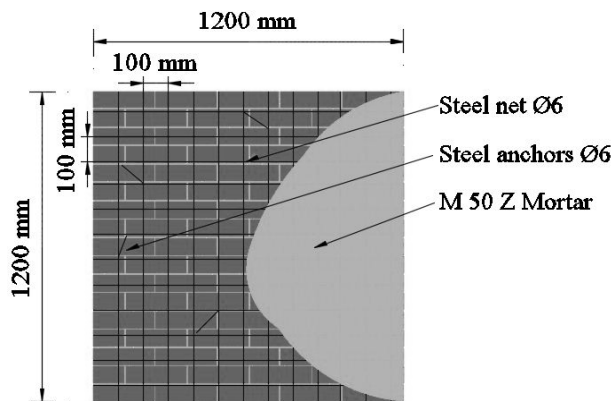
Geometrical configuration of the traditionally strengthened URM wall.
